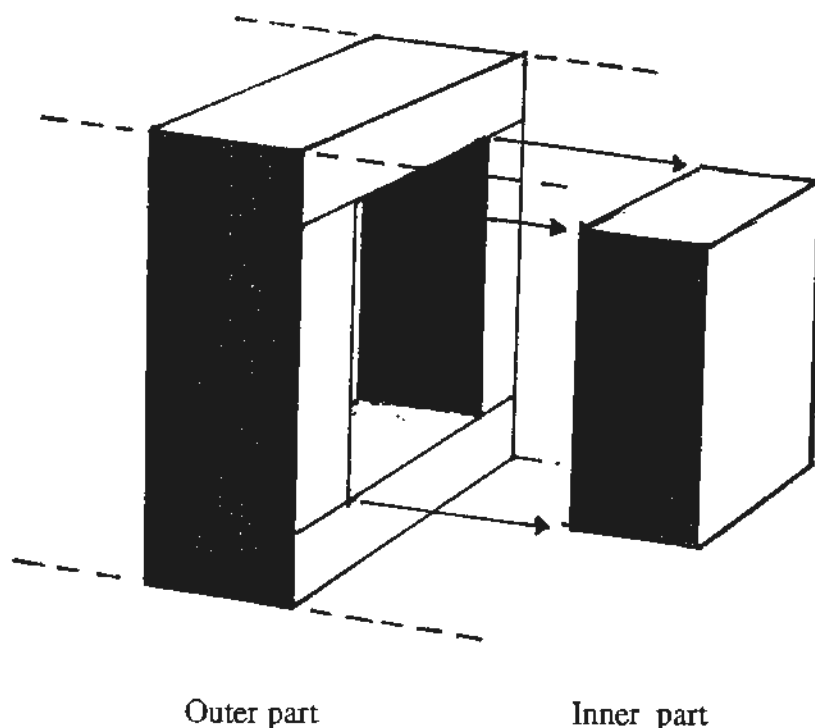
Exploded view of 50 mm slice as cut from the centre of each beam.
